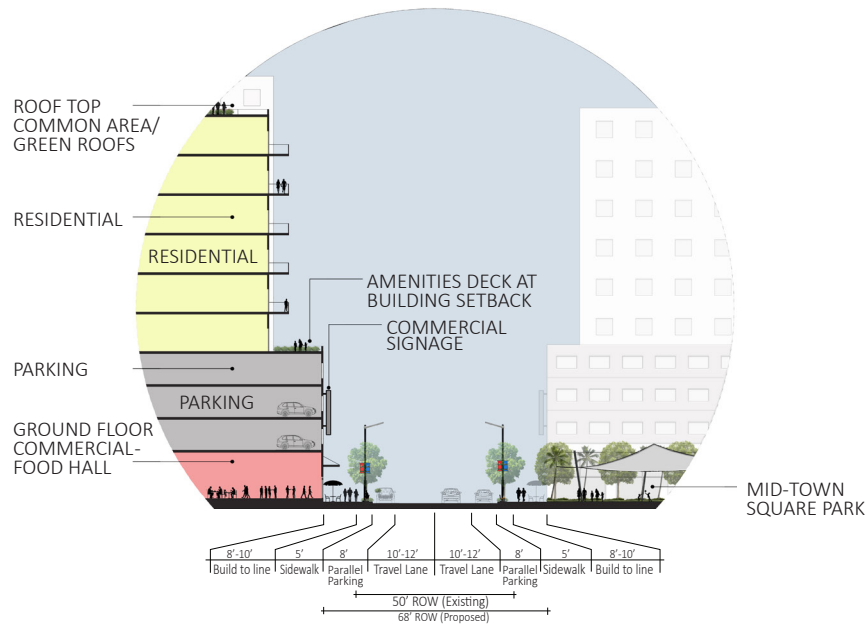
① Street Profile at Lafayette Street (Extension)
